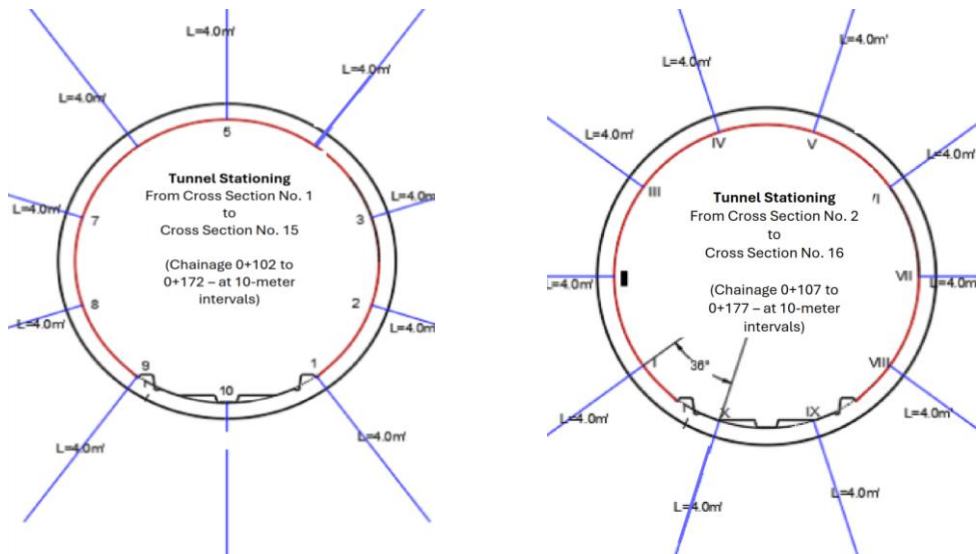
Layout of tension grouting injection boreholes (profiles at Work Site 1).
